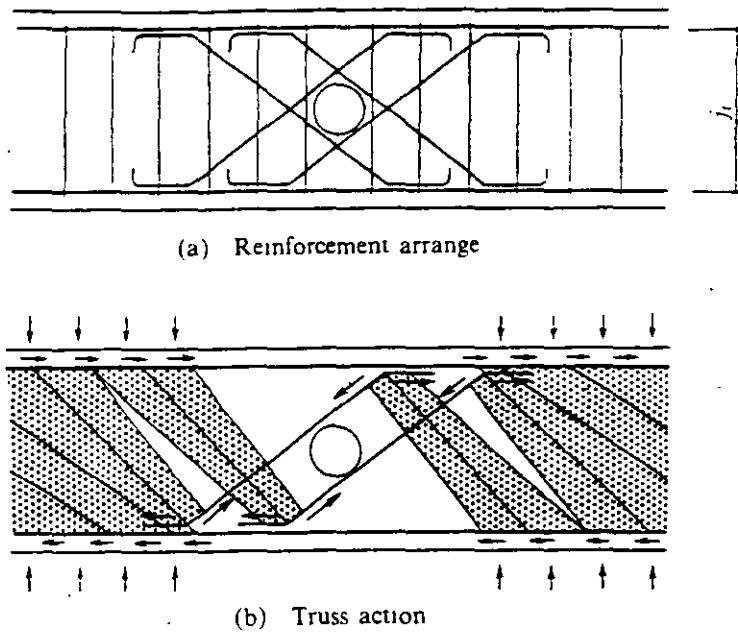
Beam reinforced by the inclined reinforcement.
